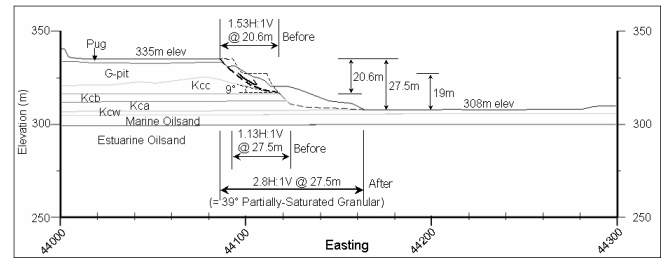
Schematic of Pleistocene-age Double Bench Failure
